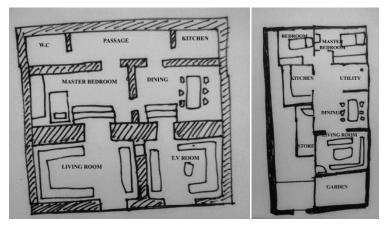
Ground Floor Plan of Hazratganj and Vipul Khand House *Source:* Author.
